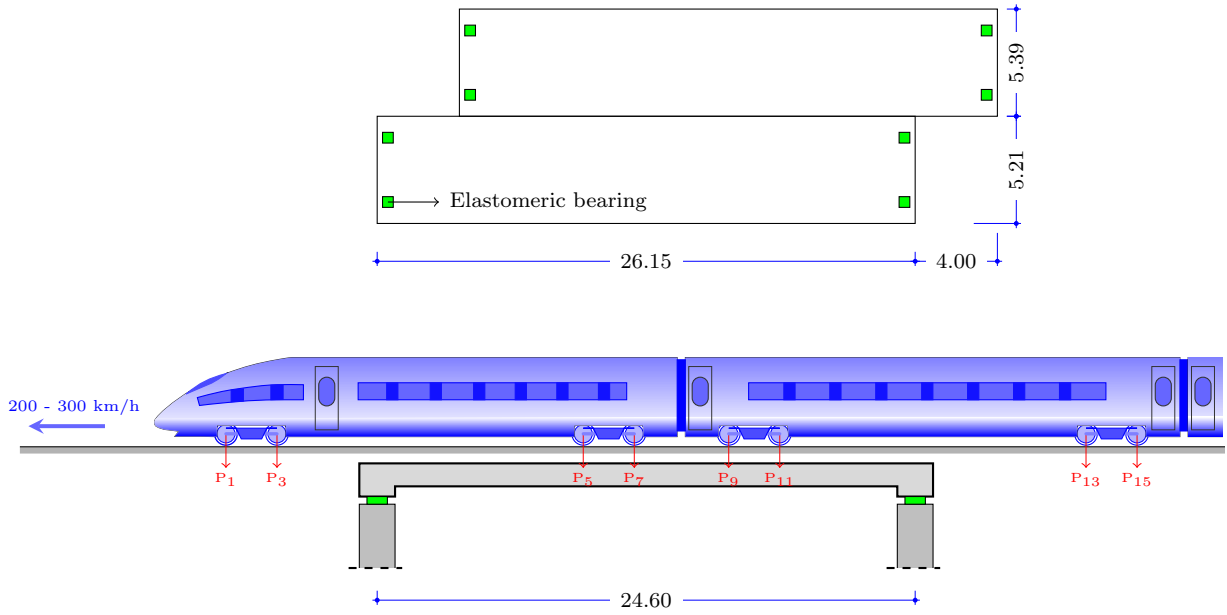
Layout and basic dimensions of the Erfttal-Brücke railway bridge
